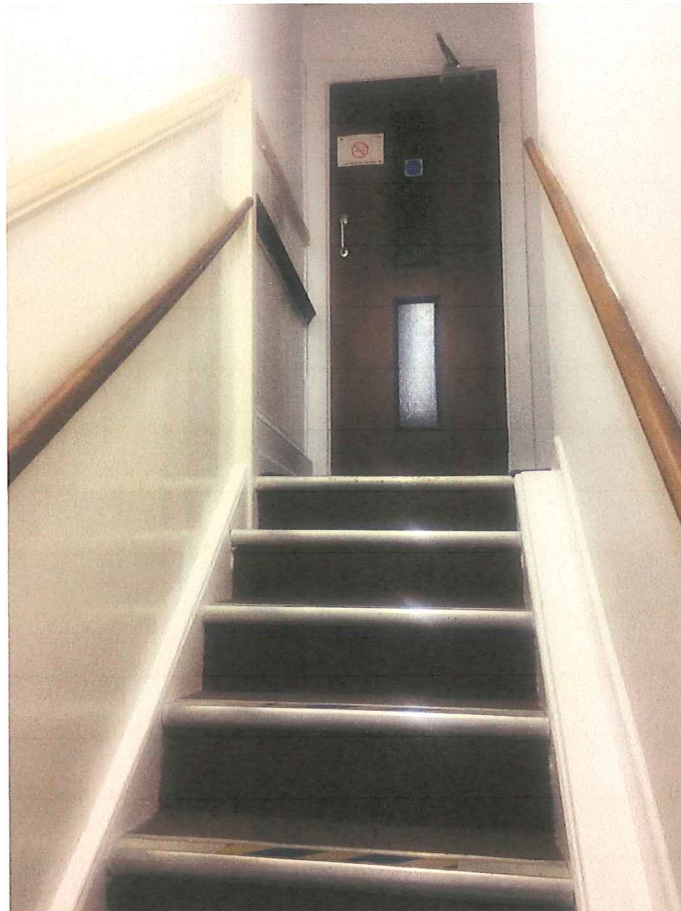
Door D.9 at head of Stairs. (Modern bullnose architrave etc).
